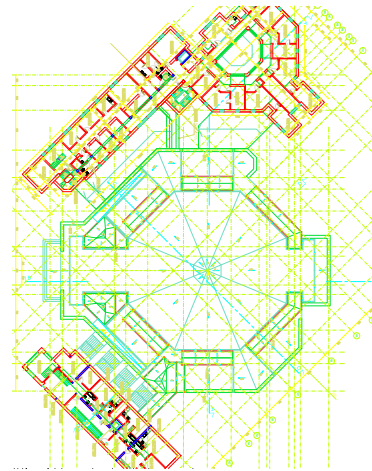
Foundation upper slab of the main unit (part of urban complex); a. The church, b. The Centre building with marked pile spacing, c. The Institute with sketched buildings. *Source:* the archive of Bogumił Wrana
